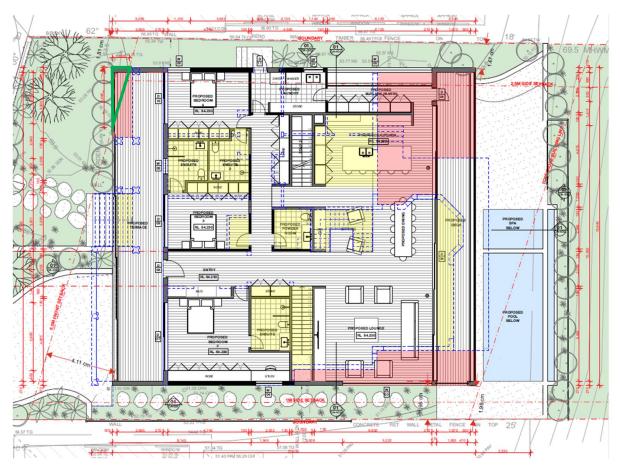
Extract of the Ground Floor Plan with the encroaching element outlined in green Source: Rama Architects
